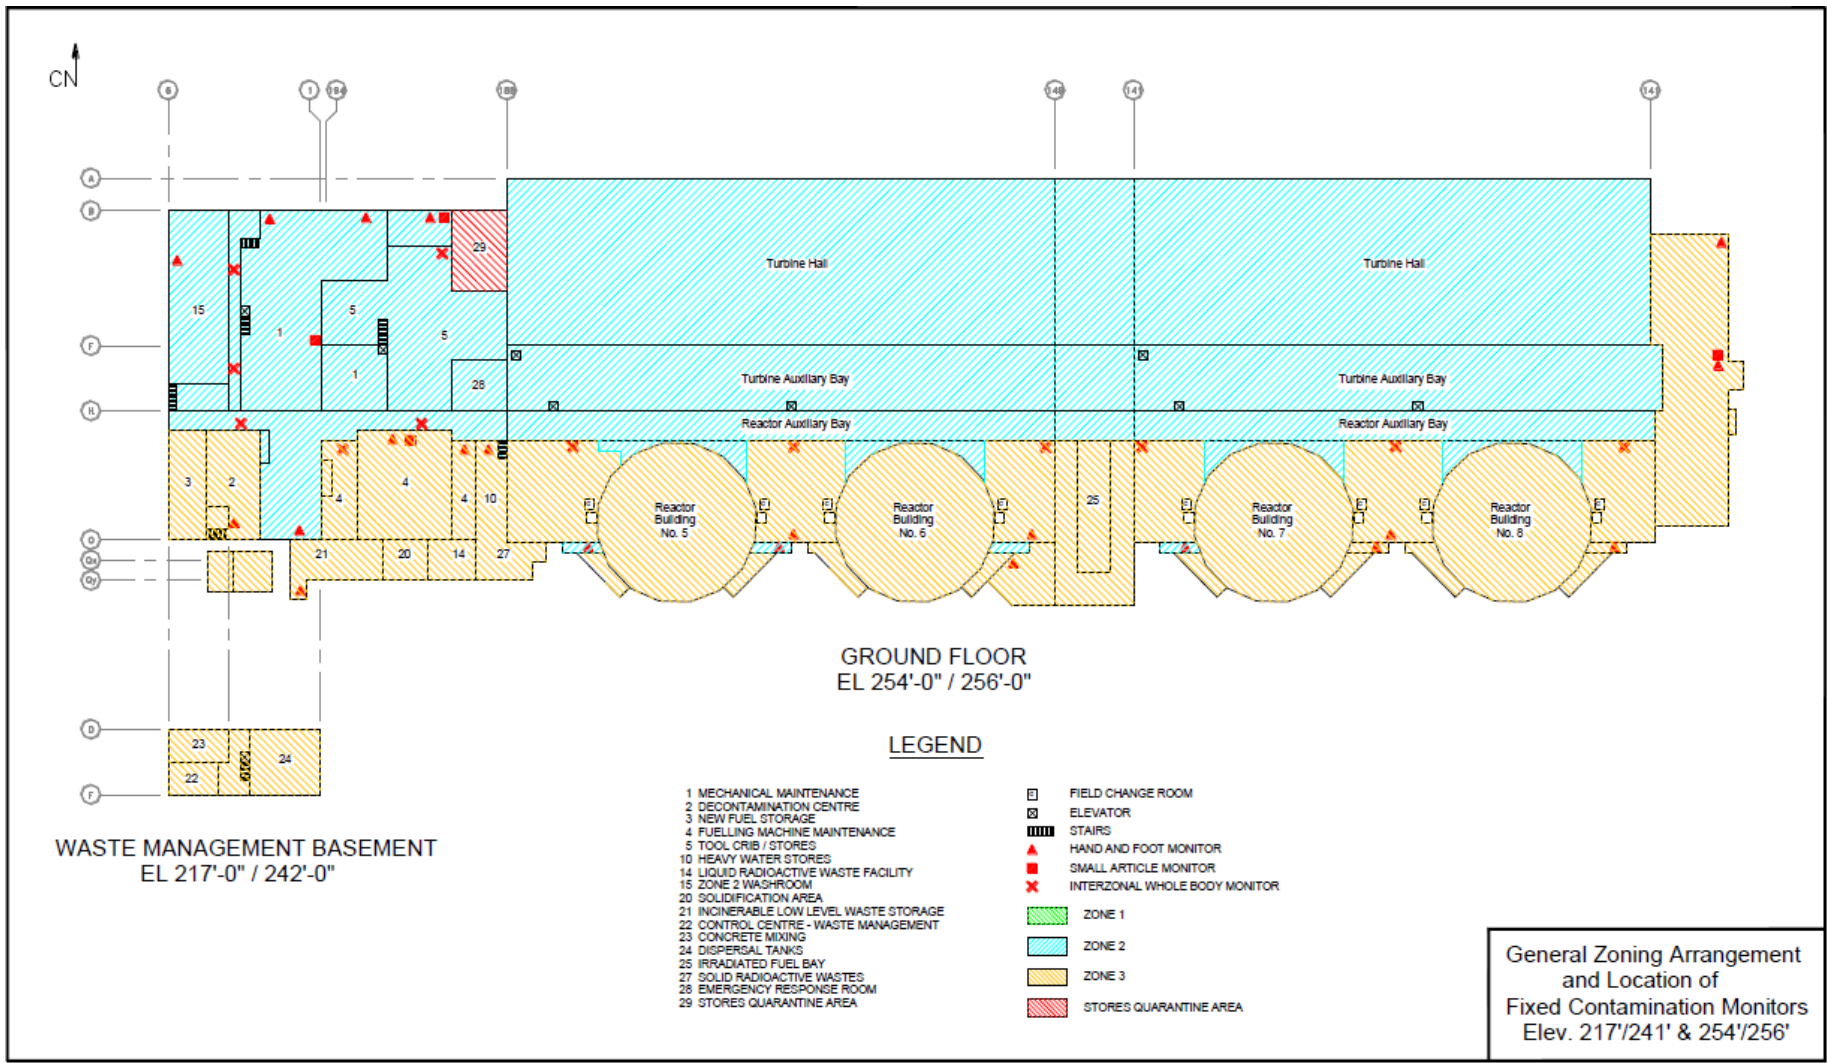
Pickering 5-8 217'/241' & 254'/256' Elevation Zoning Arrangement
